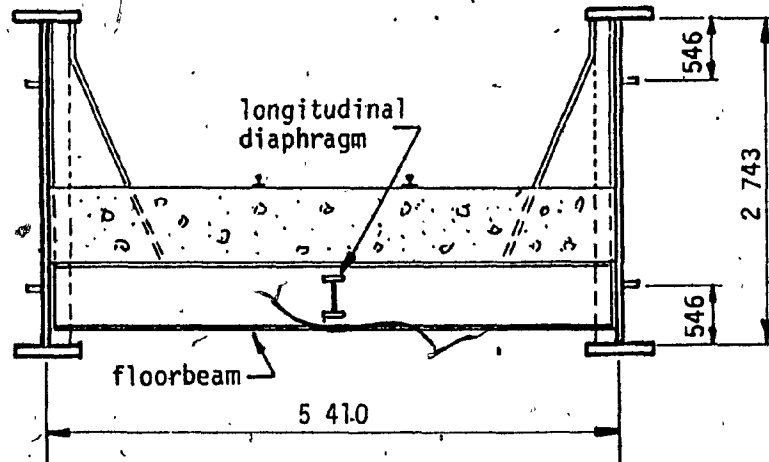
BRIDGE 8.75 - TYPICAL CROSS-SECTION
